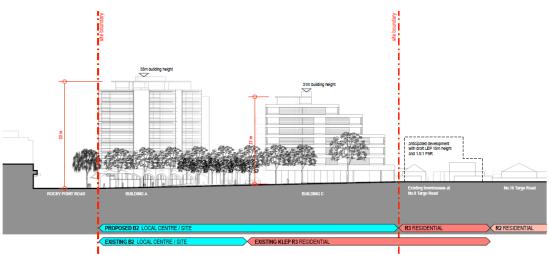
Indicative Scheme – Targo Road Elevation. (Source: Turner Studio, August 2019)
